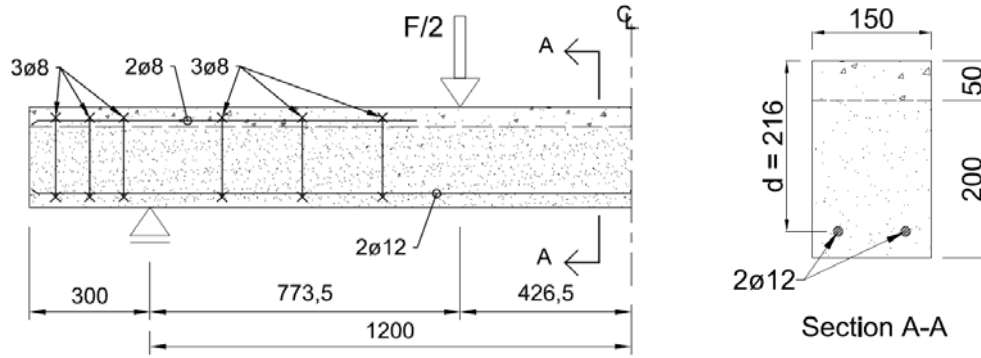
Test setup (Beam 9-12) and cross-section (dimensions in mm).
